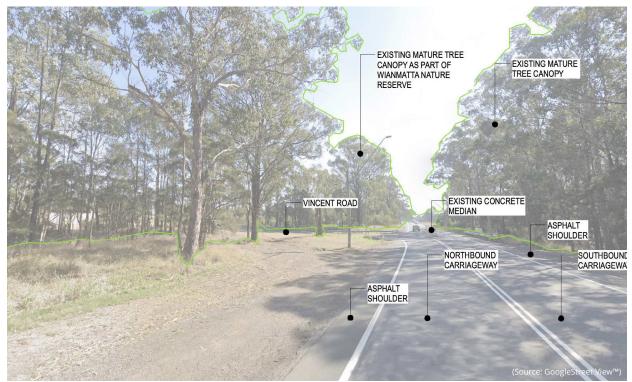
Viewpoint 3 - The Northern Road (facing north east) looking towards the Vincent Road intersection - Existing view
